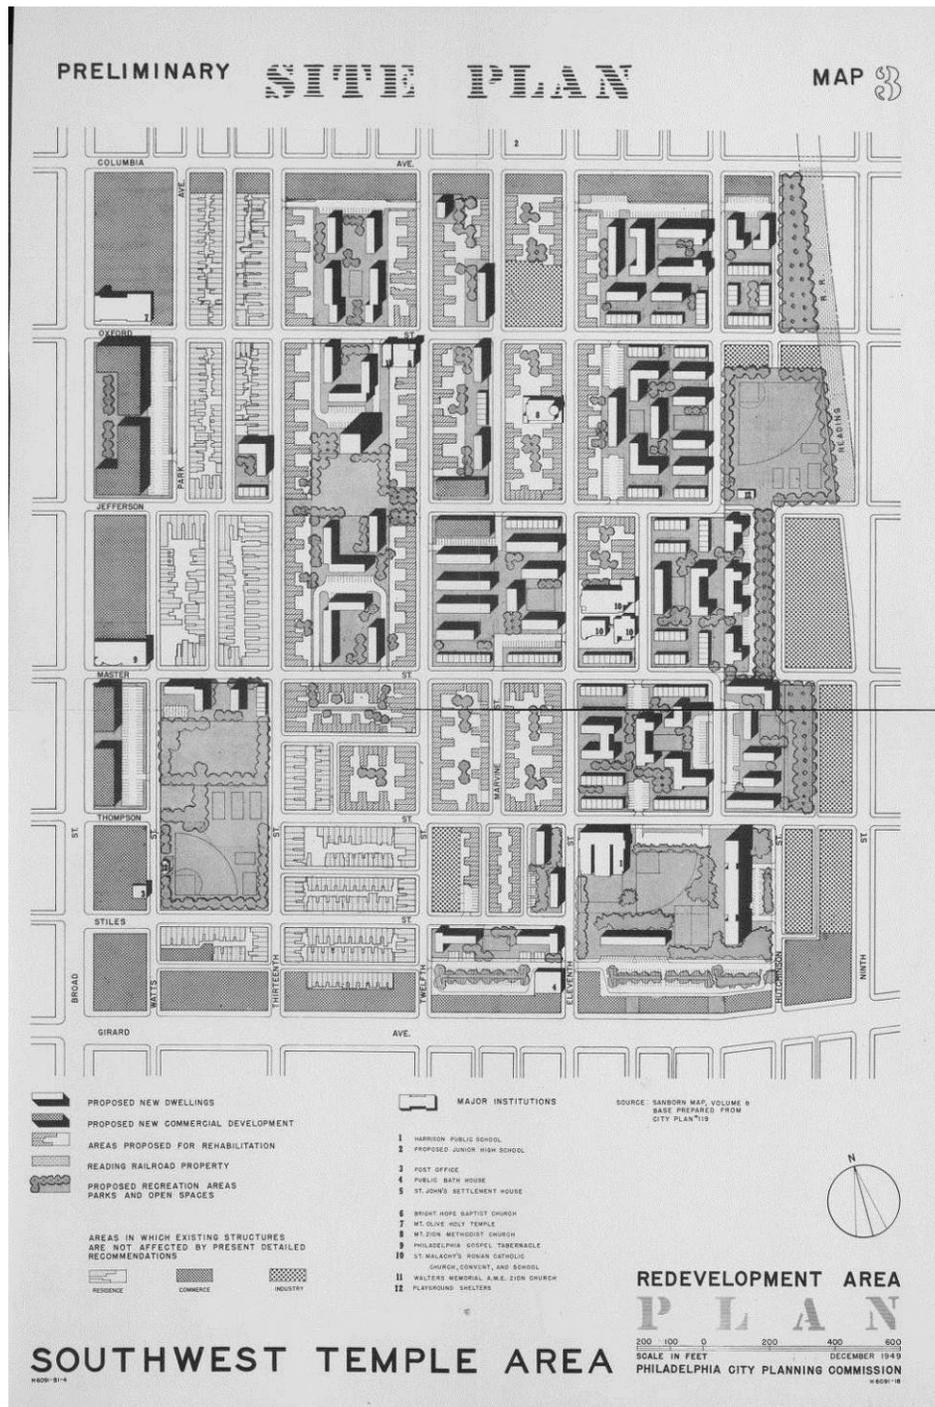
Preliminary Site Plan, Southwest Temple Redevelopment Area, 1950, showing initial “superblock” scheme for redevelopment. Source: “Southwest Temple Redevelopment Area Plan,” Philadelphia Planning Commission.
